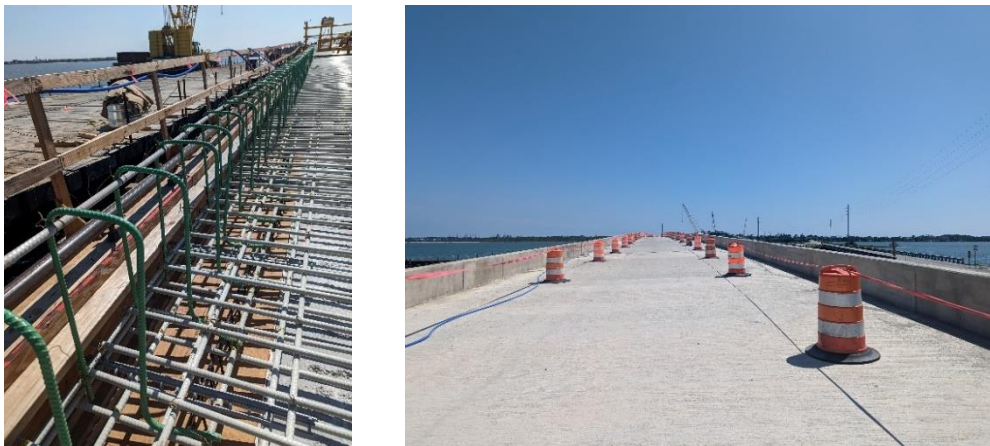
Epoxy-coated reinforcement for rail parapet and deck poured
